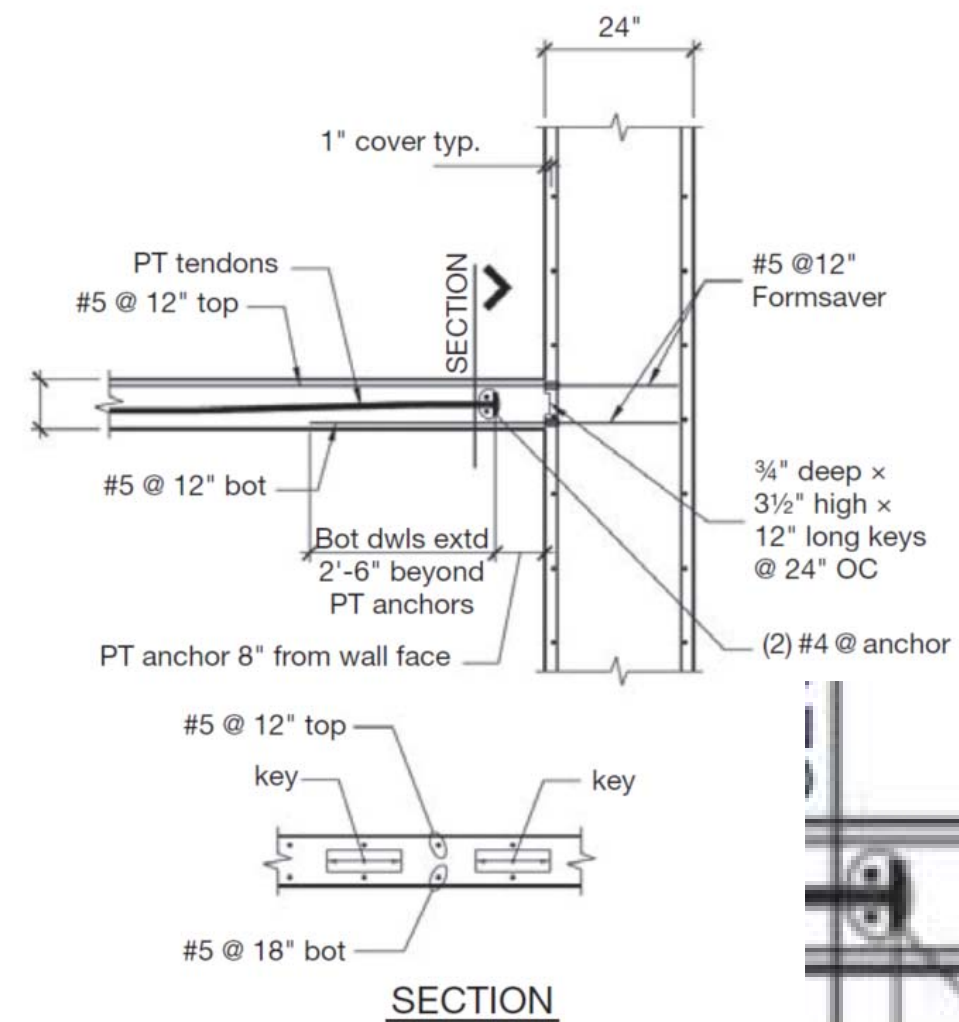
Slab-Wall Connection Detail for Specimen 2
